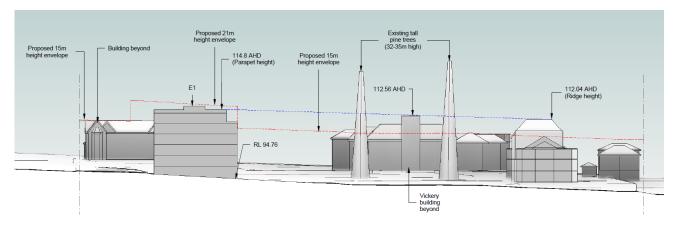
Proposed envelope and existing courtyard – section looking east towards Carrington Road
